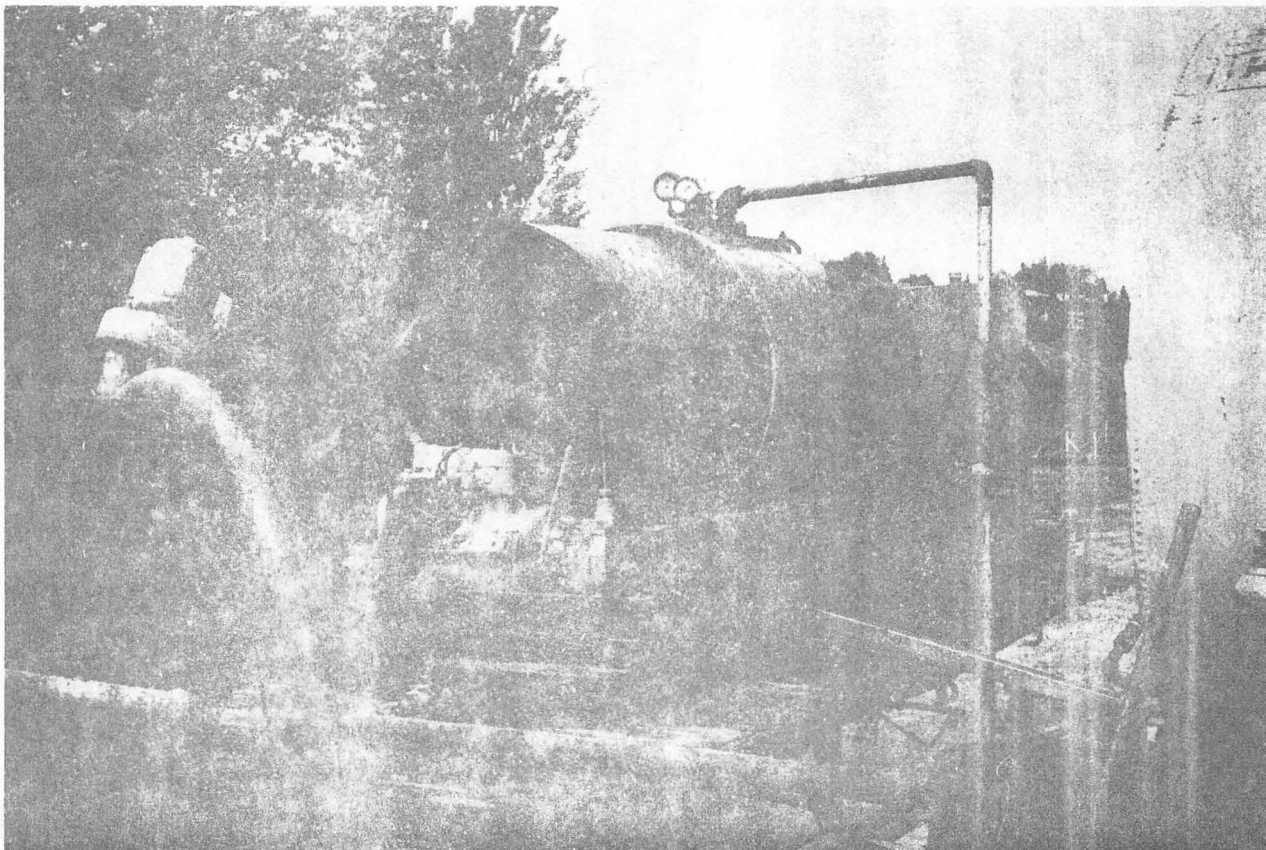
PLATE VIII. Central batch plant. Mixing hopper on left, oil heating center, storage tank on right.
